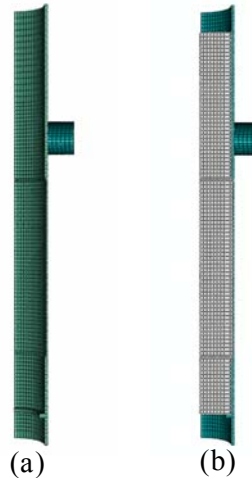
Geometry of the FE models: (a) control specimen (b) grouted specimen
